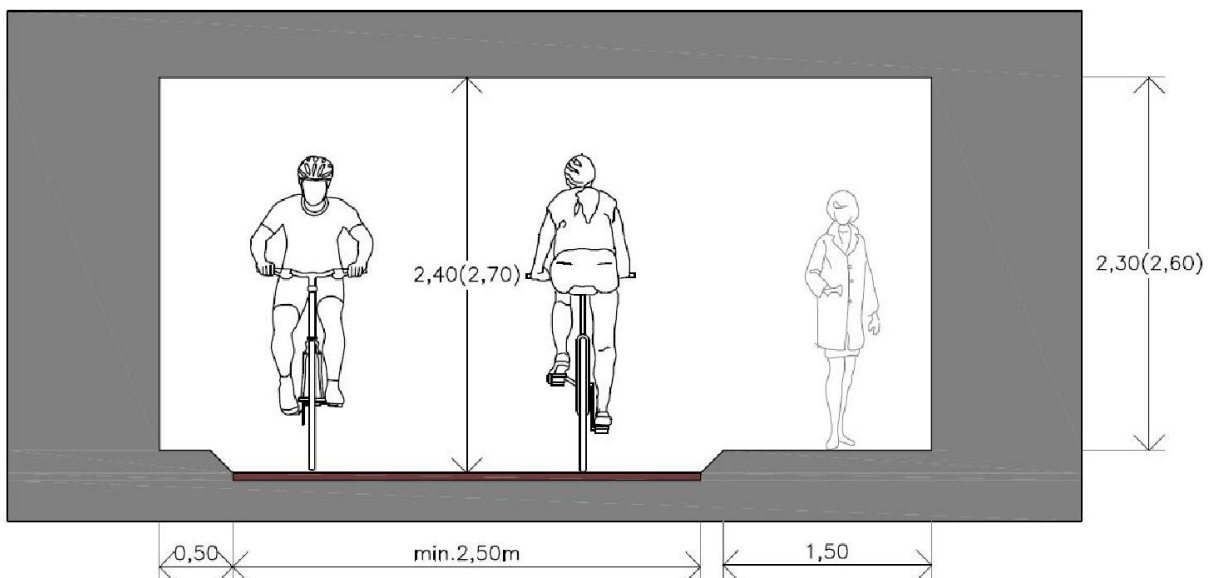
Minimum permissible profile of a two-way cycle area in an underpass/tunnel with demarcated areas in Slovenia. [29]
